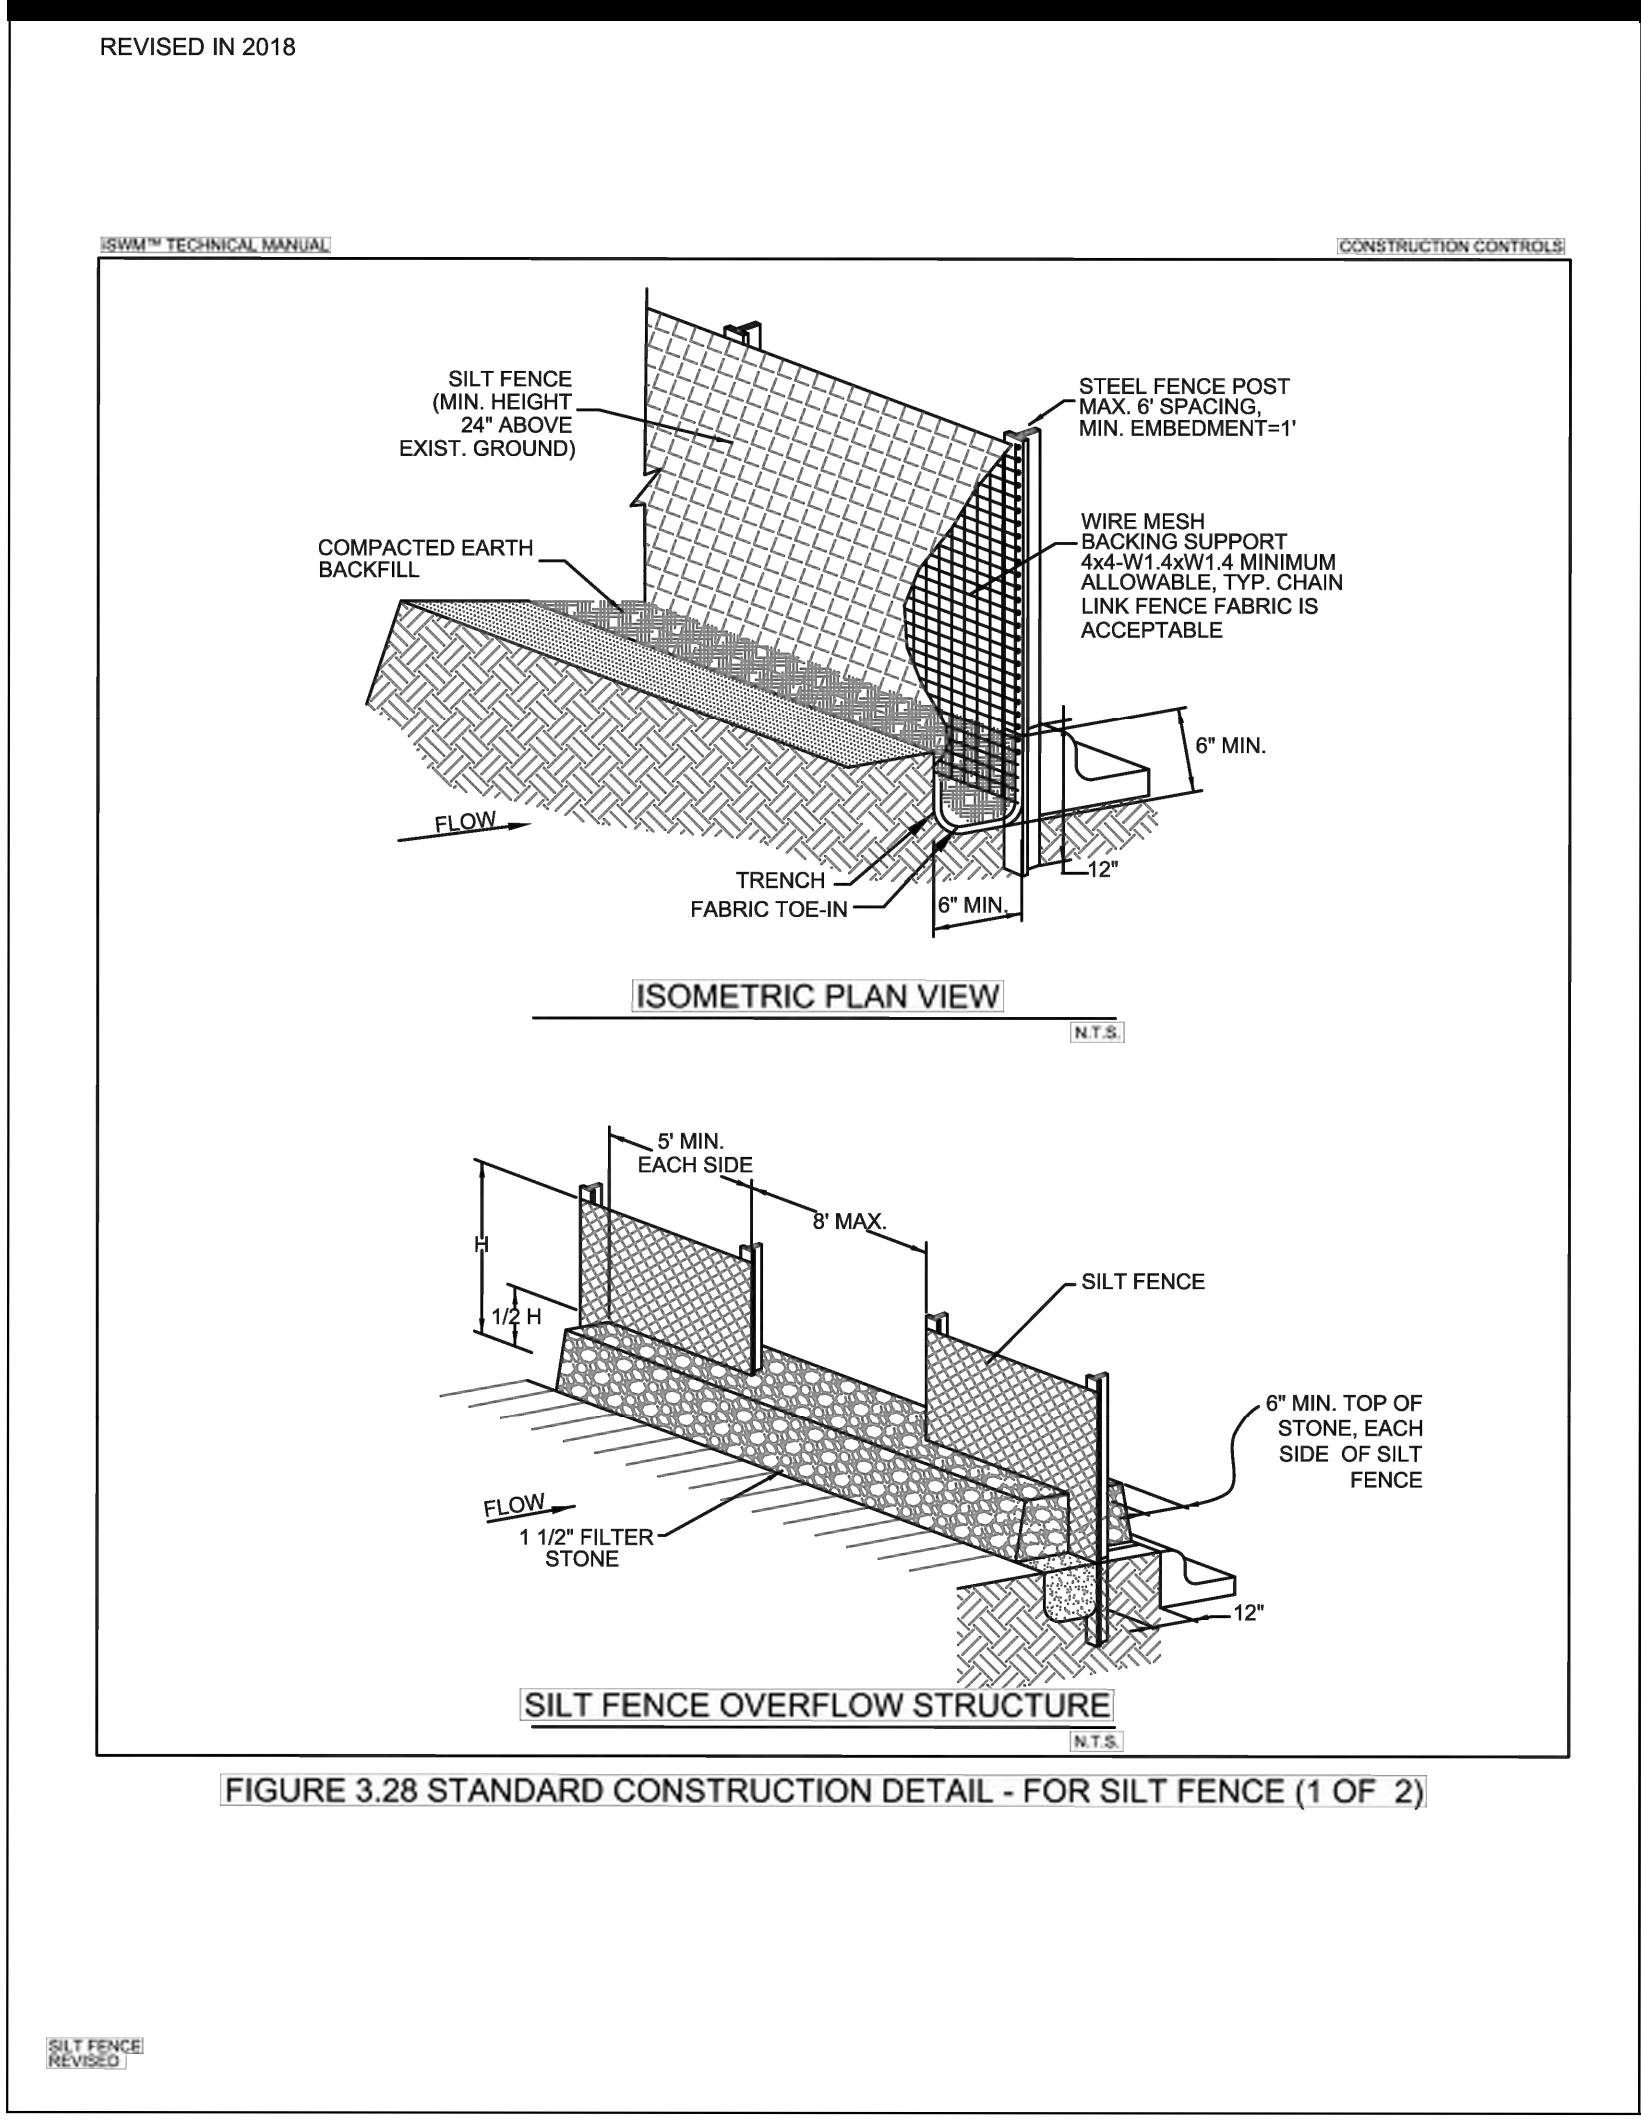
STANDARD CONSTRUCTION DETAIL - FOR SILT FENCE (1 OF 2)
